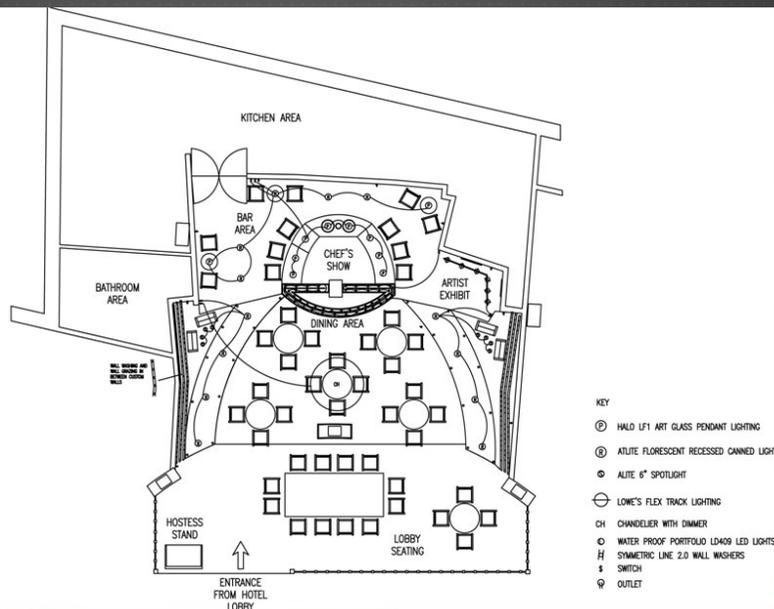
Lighting and floor plan with curvilinear forms inspired from Buraimoh's painting (Group C).
